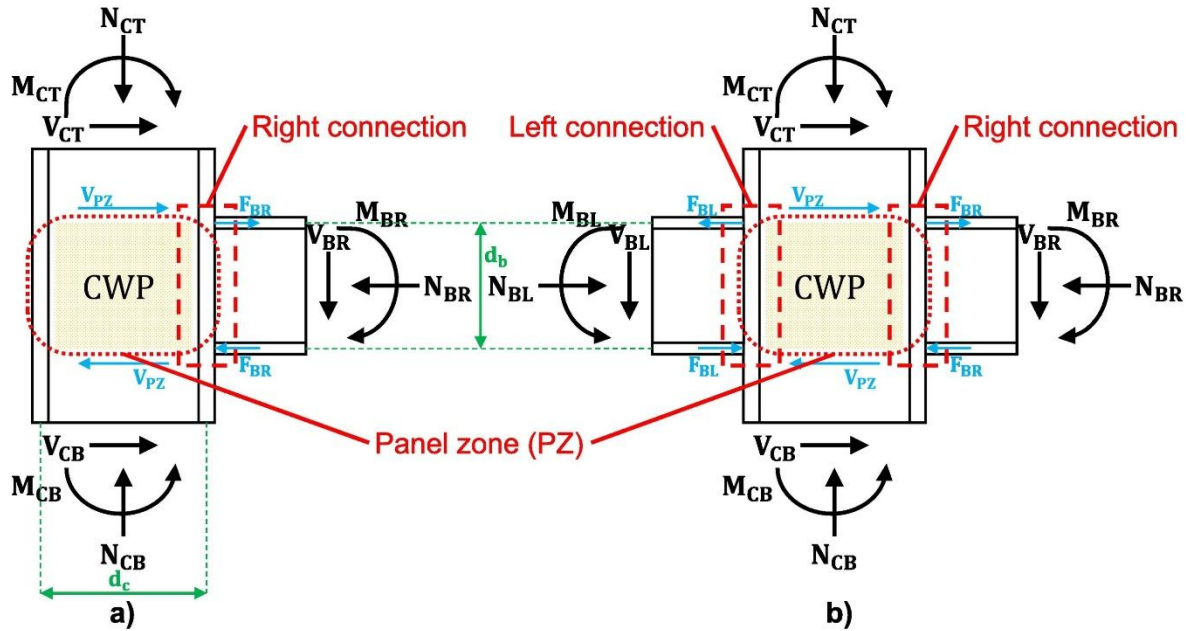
Welded joints: (a) exterior and (b) interior configurations (adapted from [1]).
